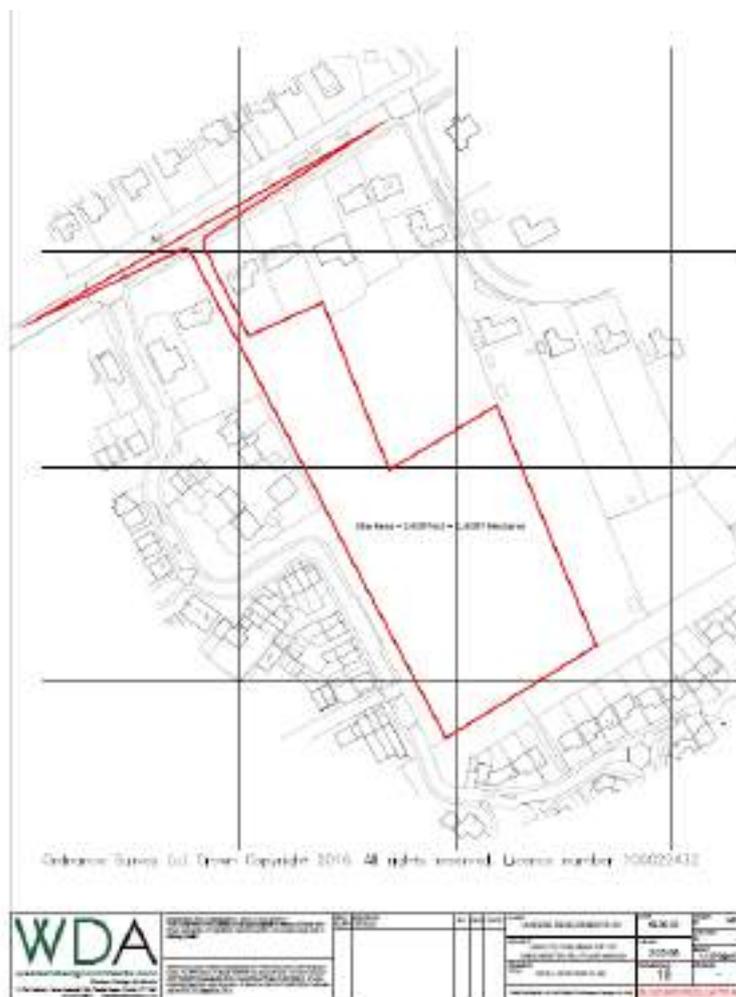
Site Location Plan extract (courtesy of Western Design Architects)
